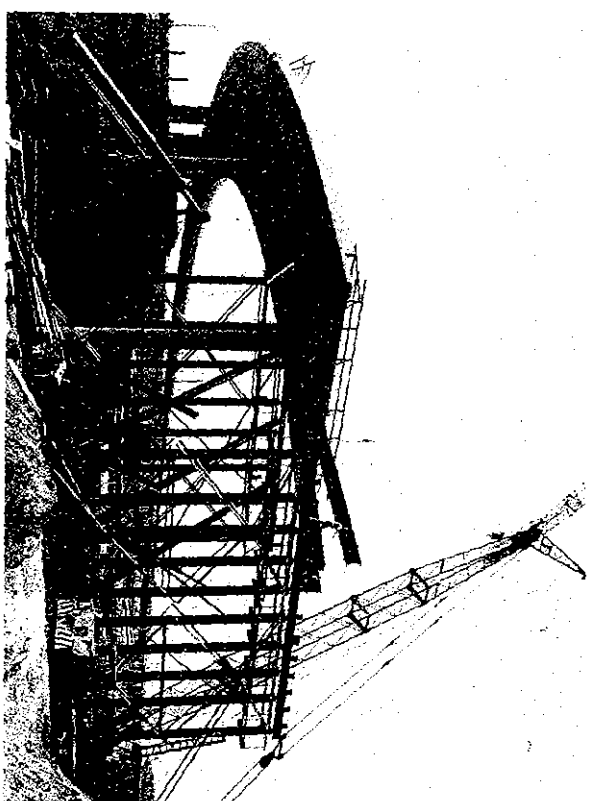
The steel frame of the bridge at Highway 27 and Queen Elizabeth way interchange, Toronto (temporary structure)
